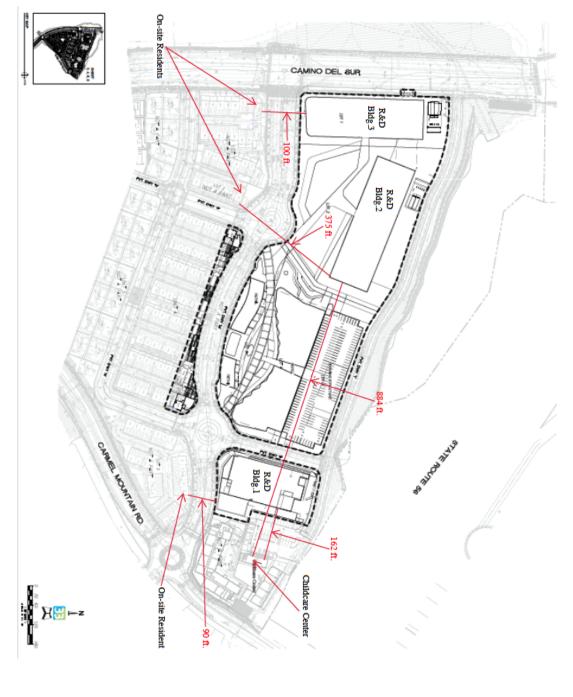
Merge 56 PDP Plans with Measurements to Child Care Center and Nearest On-site Residences
